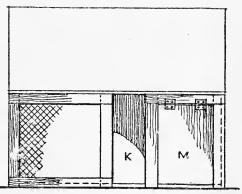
Front Elevation of Hutch, with Outer Door Removed
